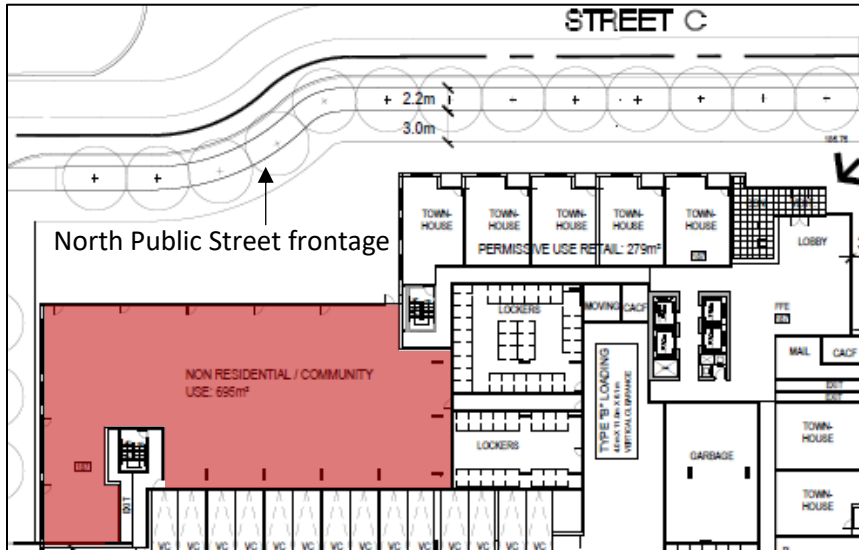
Ground Floor Retail is provided where it is required by the Secondary
